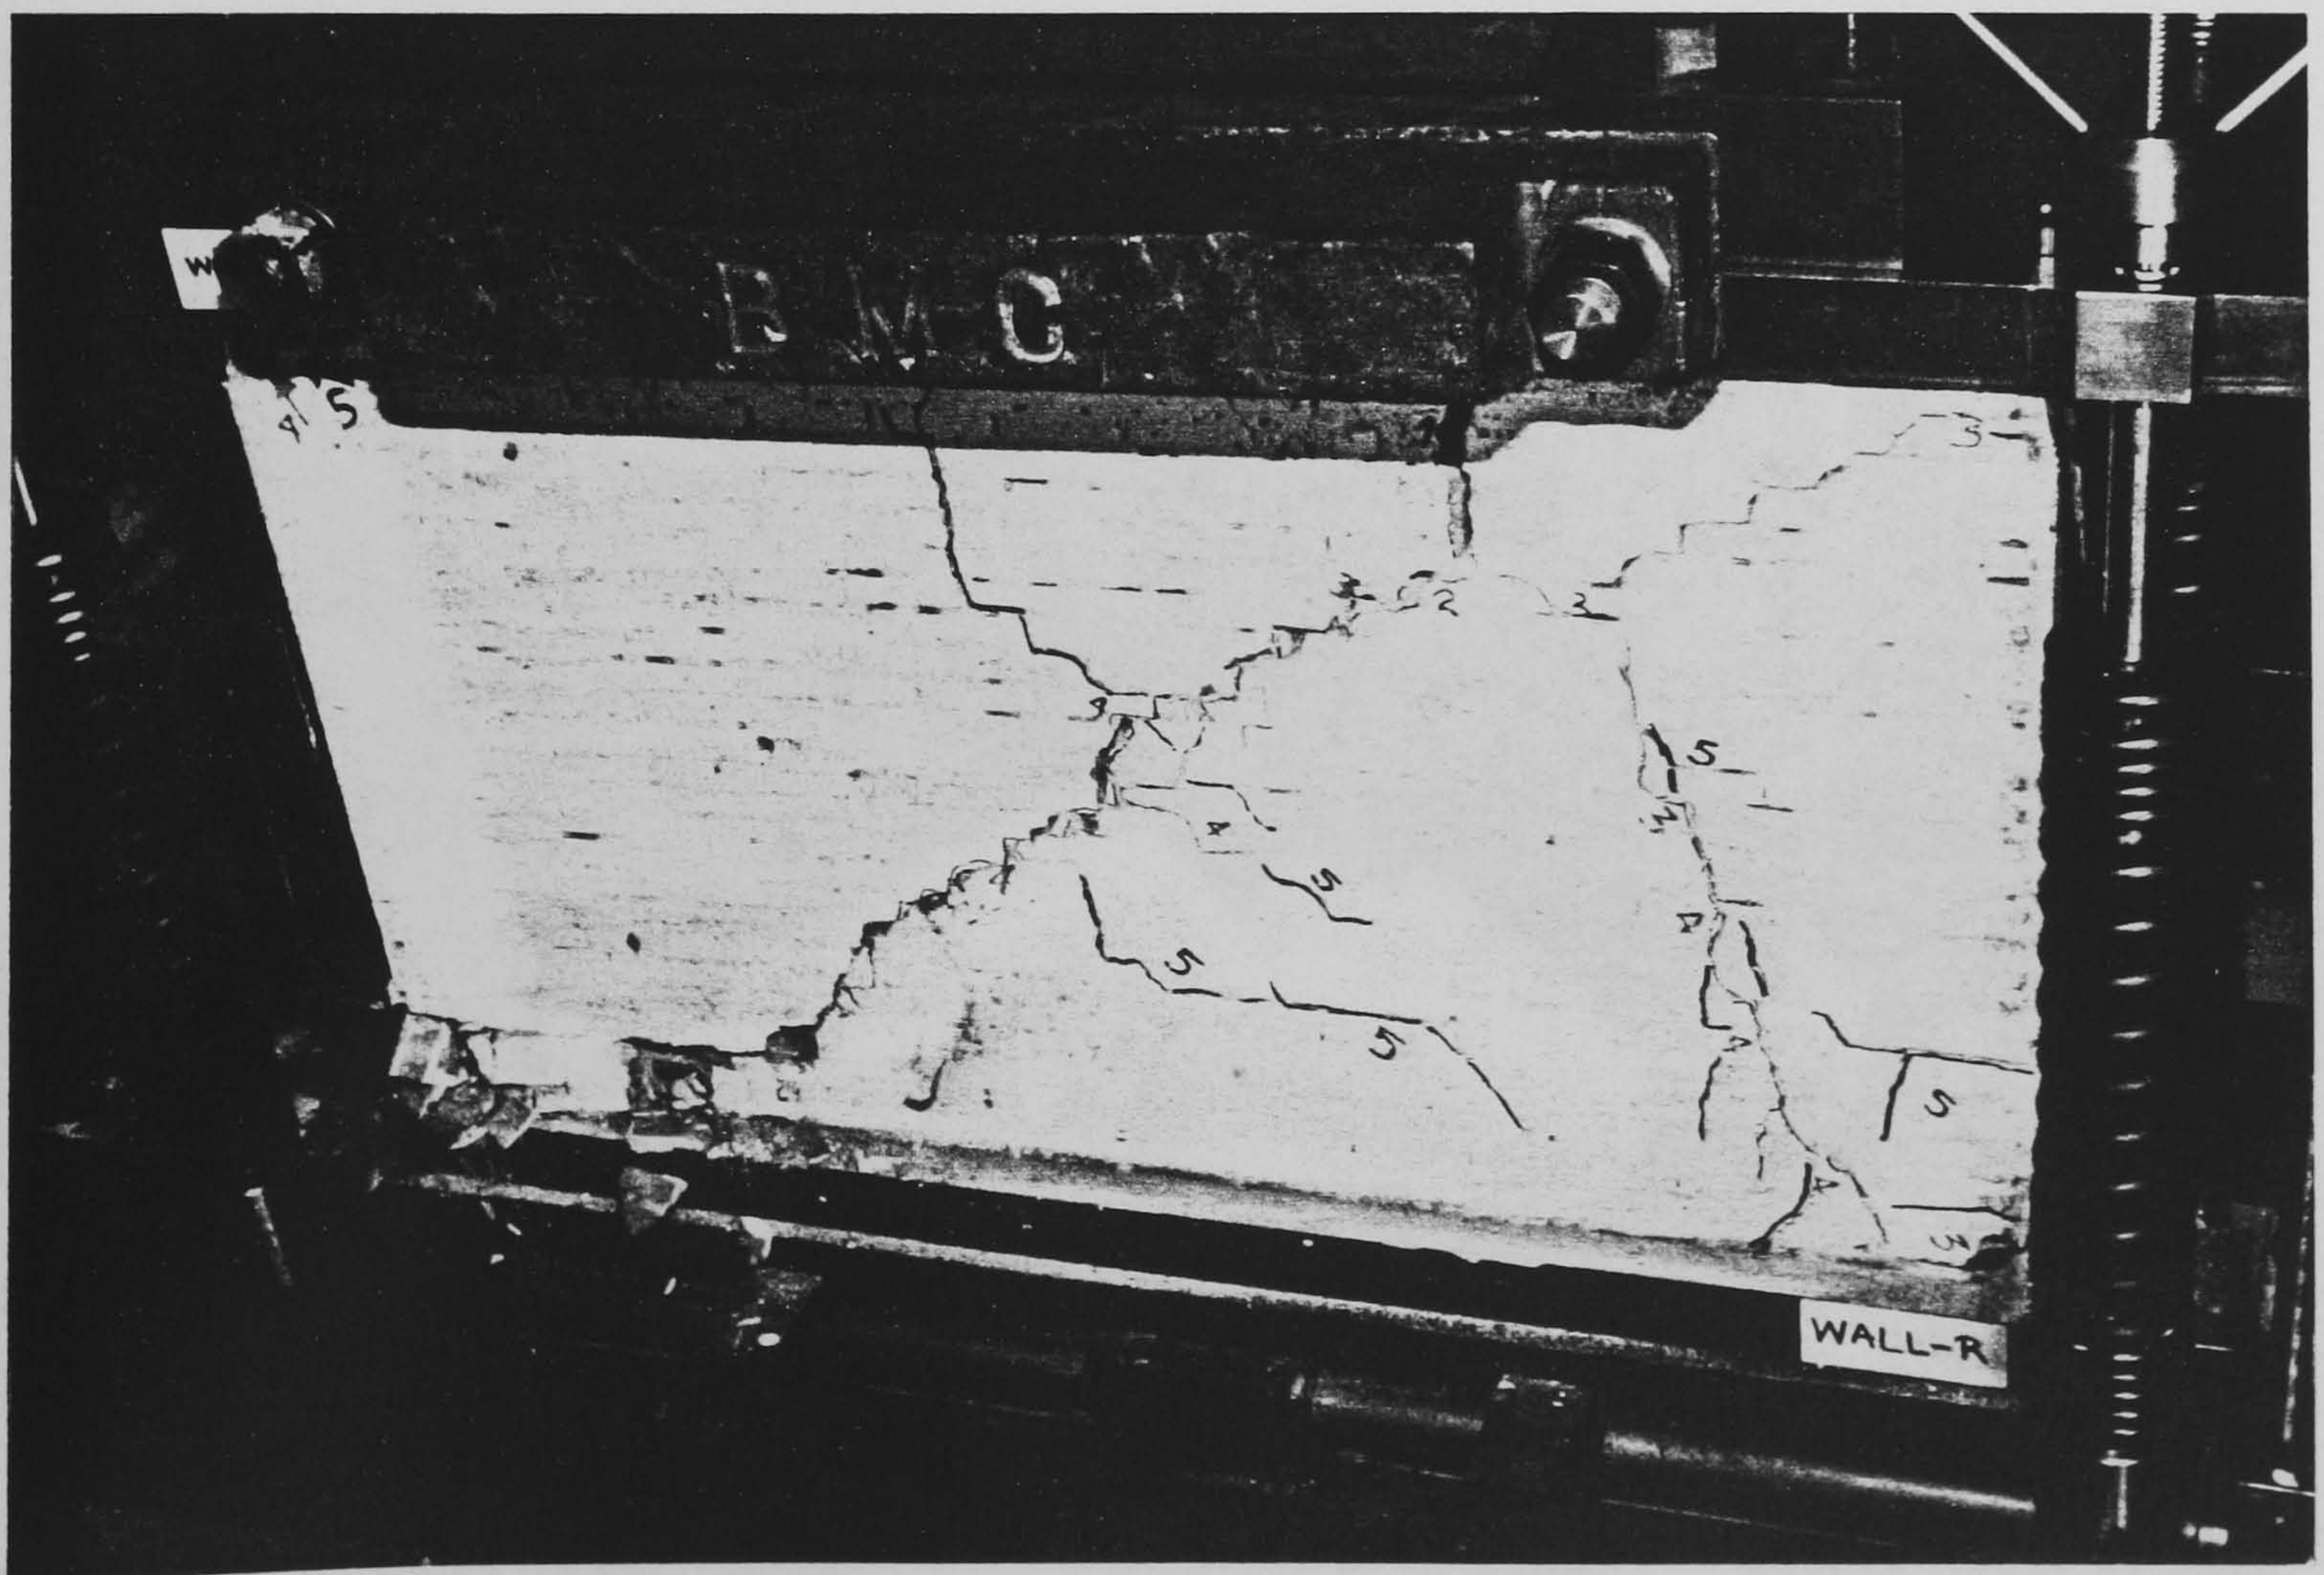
Collapse sequence-frame 2 (wall-R)
